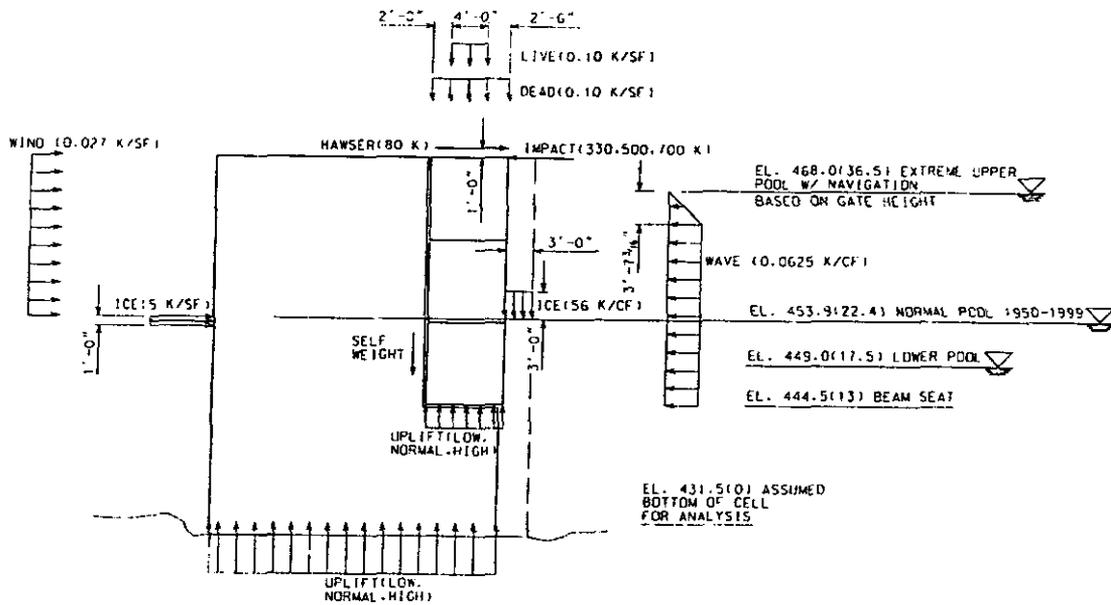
Typical Section Through Lower Guide Wall Extension for Lock No. 22 with Loads and Water Elevations
